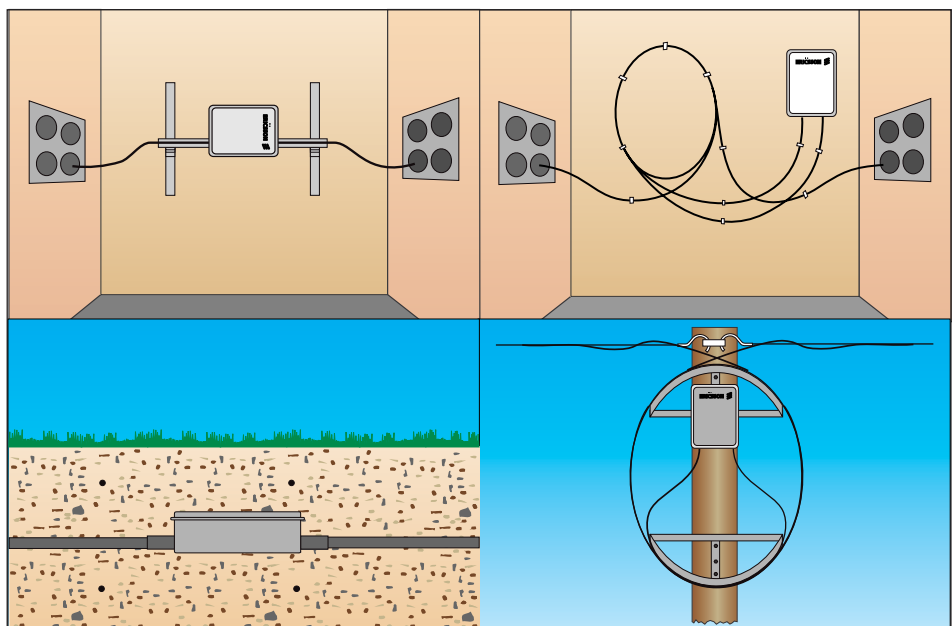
Different alternatives of installing a splice box: in a manhole, on a riser, underground and on a pole.
